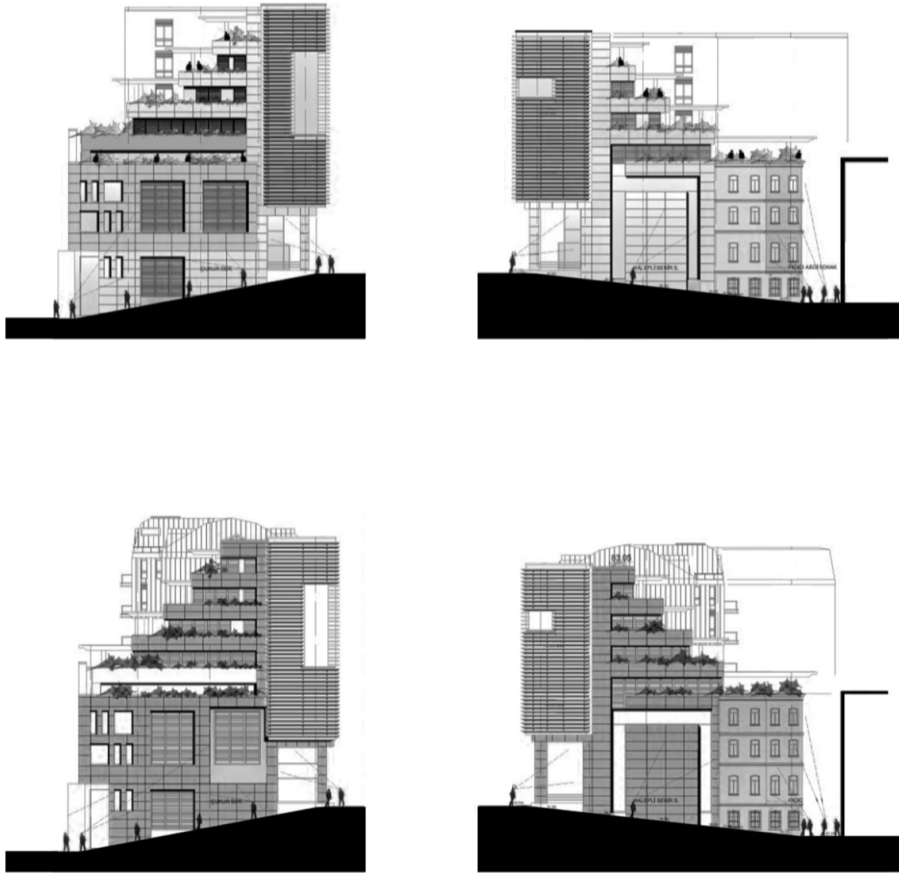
Beyoglu-Tarlabasi Street Facade Studies: Cukur and Halepli Bekir Street (Taksim 360 Archives)
